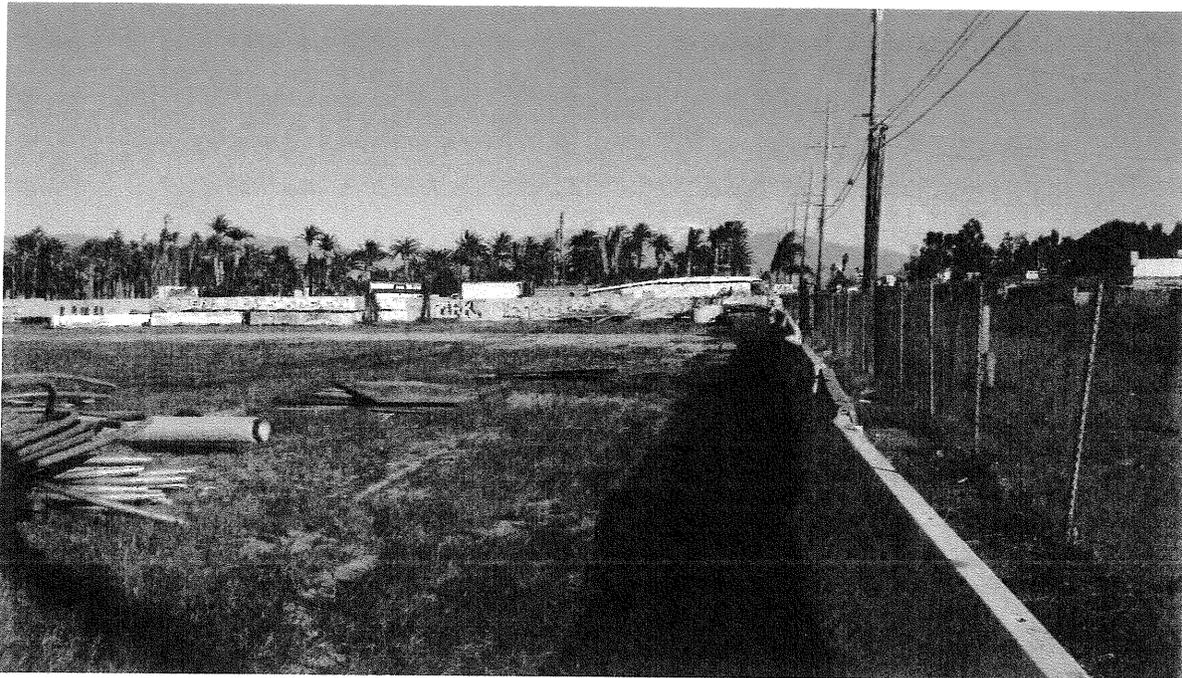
View of subject site looking west from the southwestern corner of the subject property.
